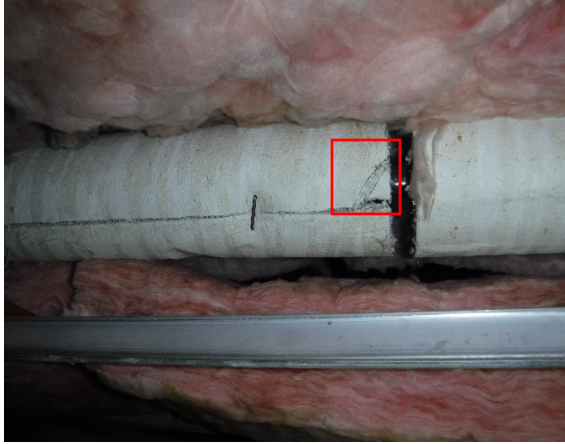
Photo of sample AS-27, Room 110 – Piping Insulation, Straight Run Air-Cell, 65% Chrysotile Asbestos.
